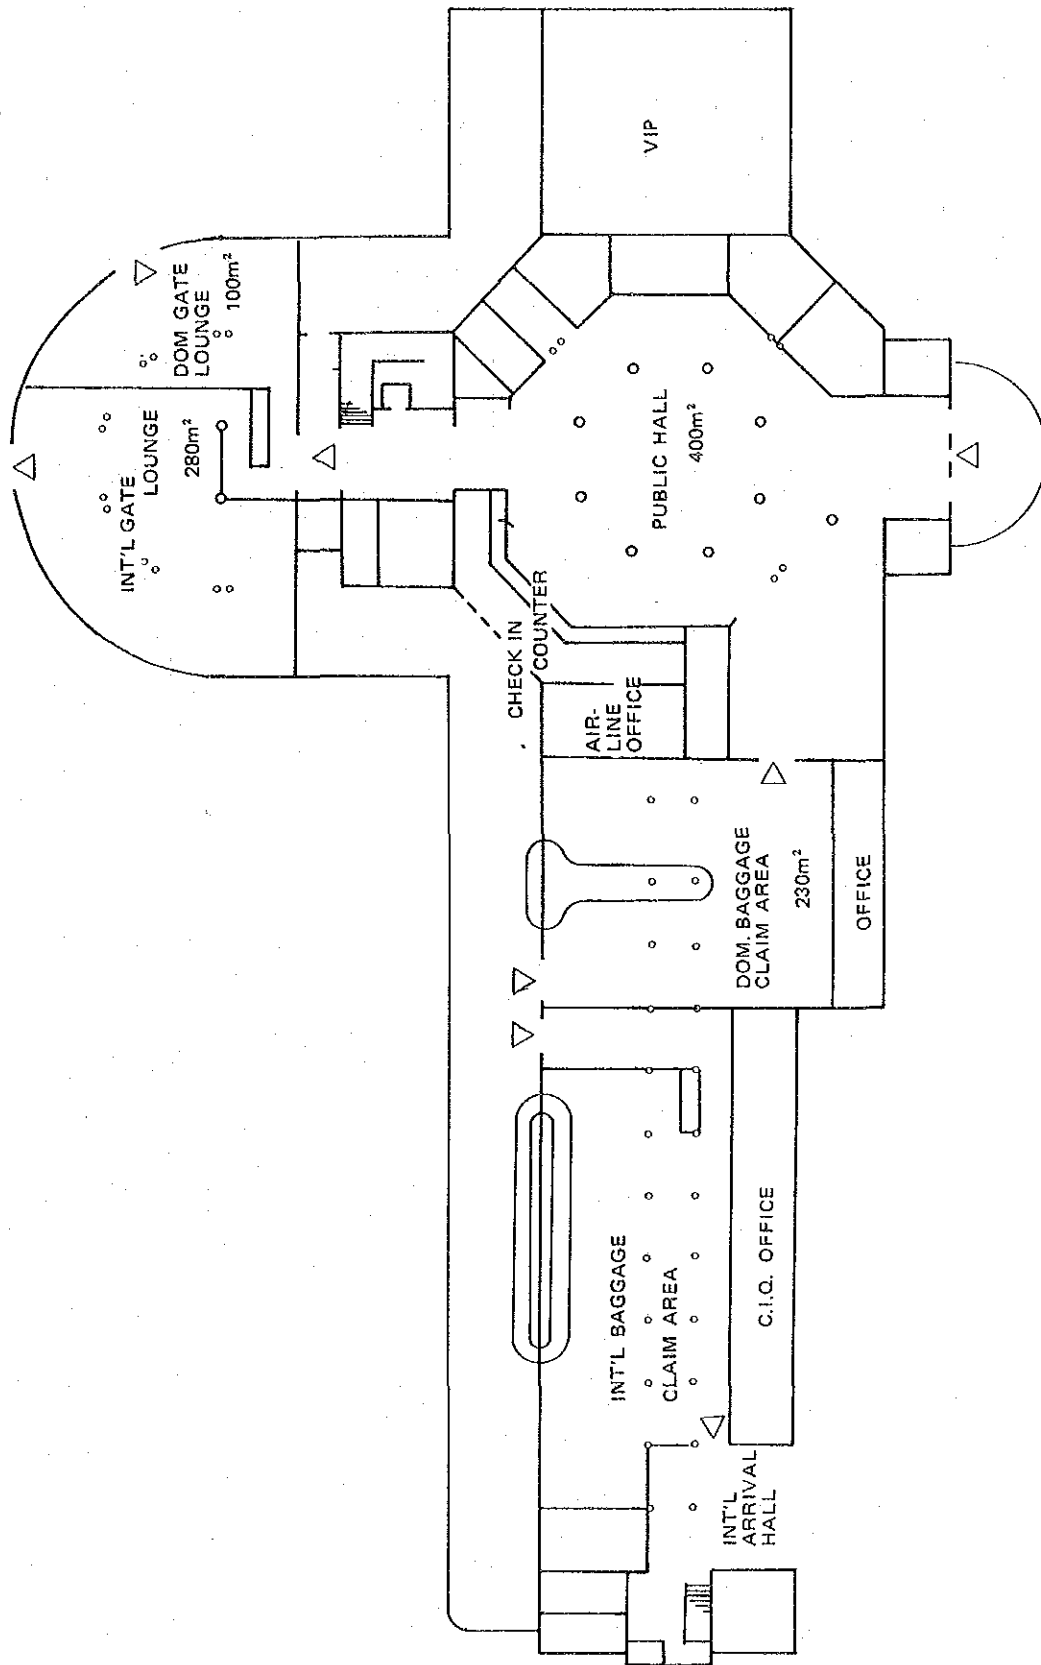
Improvement Plan of Passenger Terminal Building
